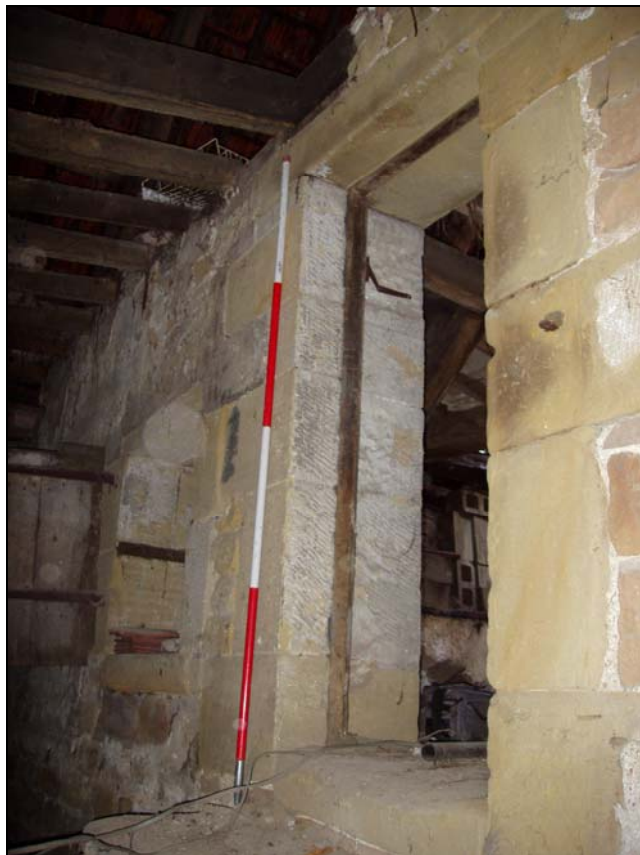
, 117: oblique view of the south wall with doorway [12] and hatch [13], from the northwest
